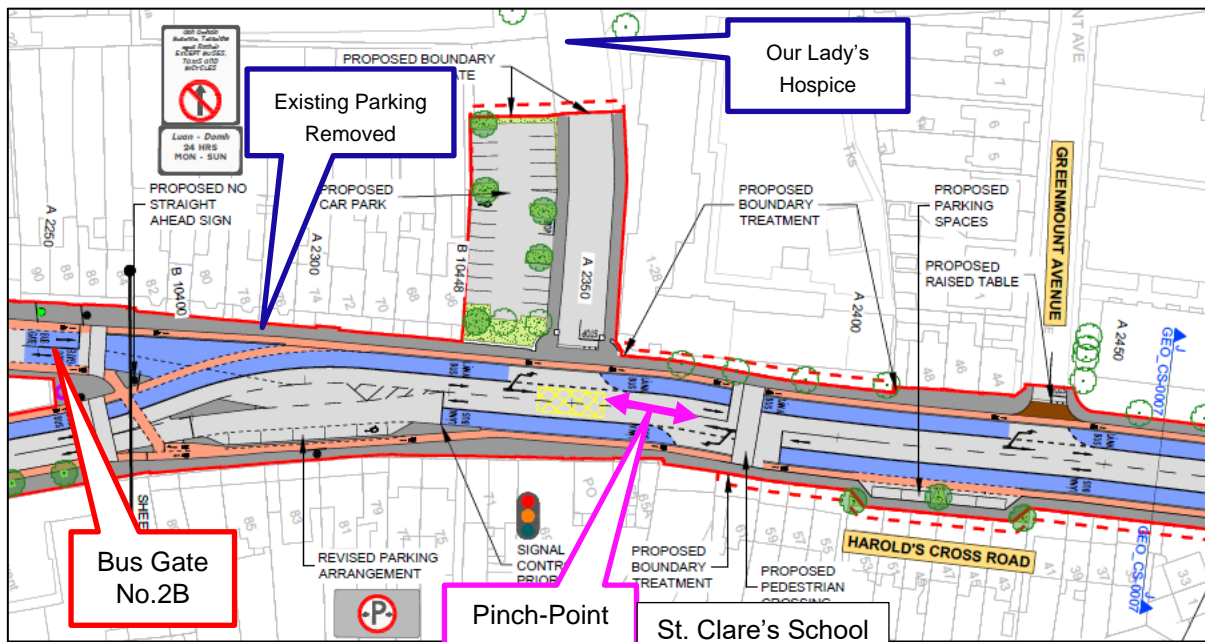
Proposed Road Layout on Harold's Cross Road at southern end of Section 2
